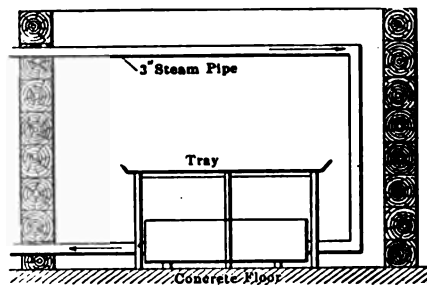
THAWING HOUSE AT TRADERS MINE.
